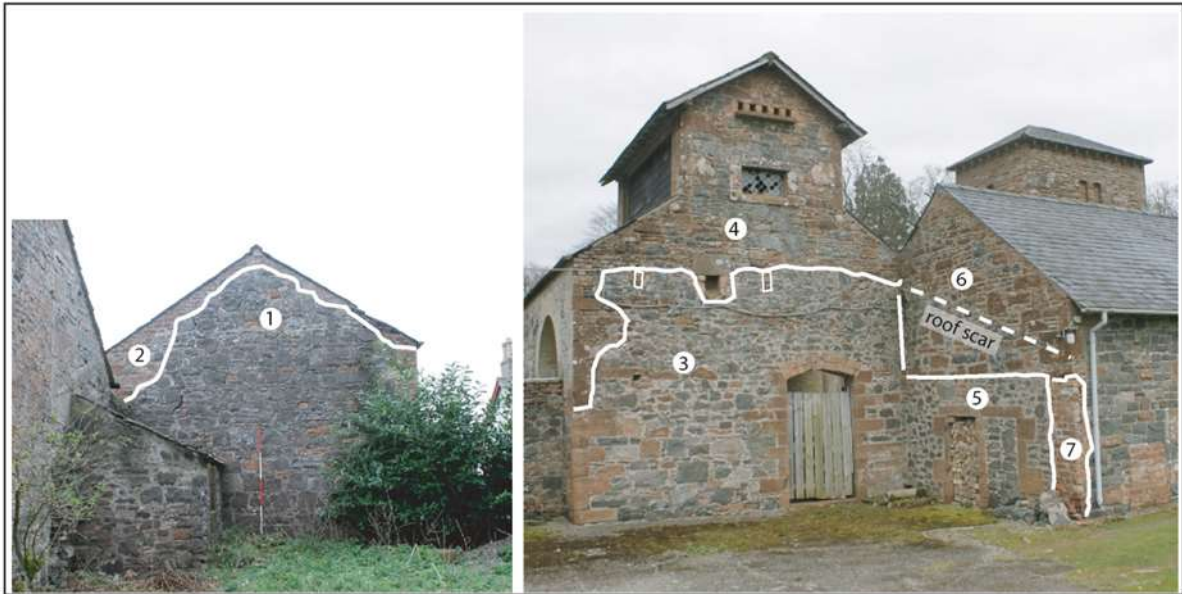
Wall sections in the West Wing (north gable to left and south gable to right).
